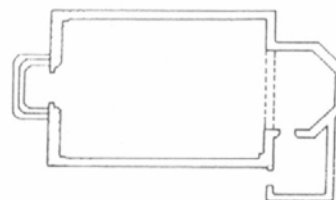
Plan of the church Santa Maria del Fossale [Do 94].
